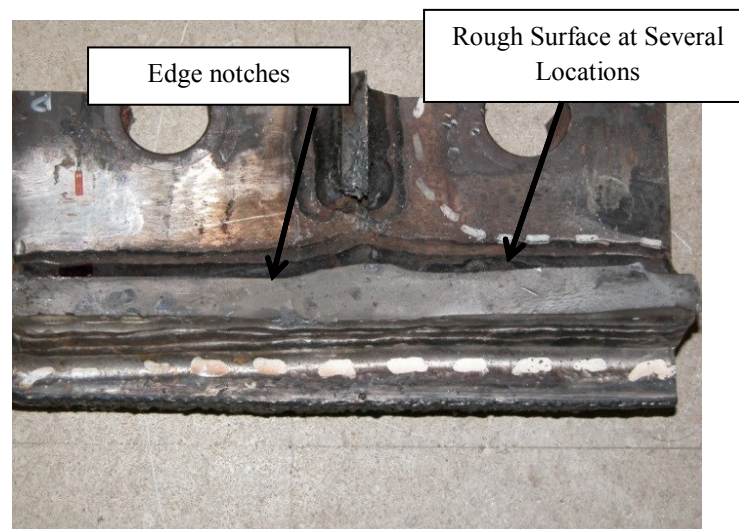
Fractured surface of side 1 of specimen G-N-3.
